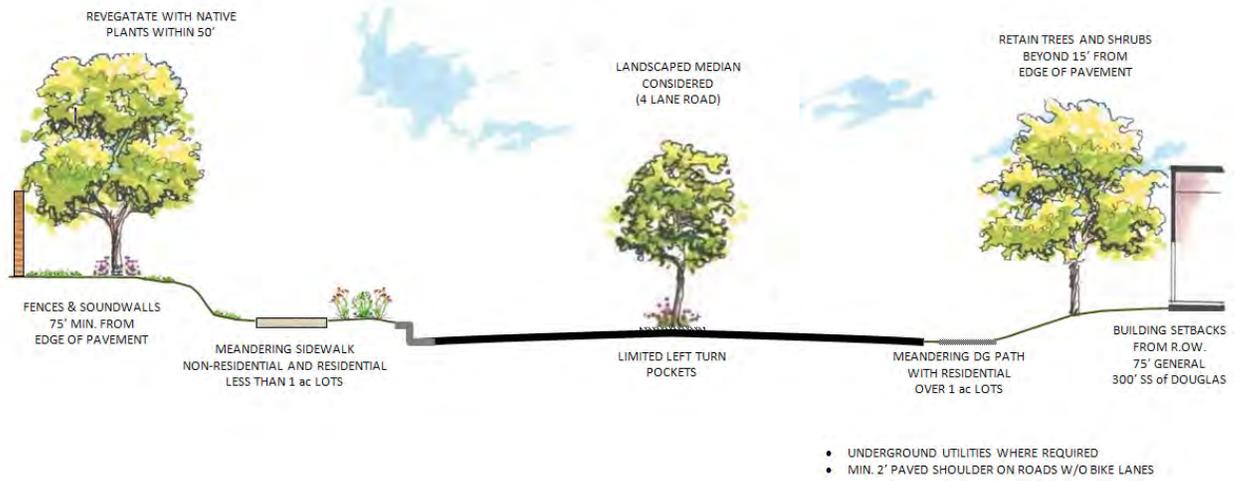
Scenic Road- Typical Cross Section.
